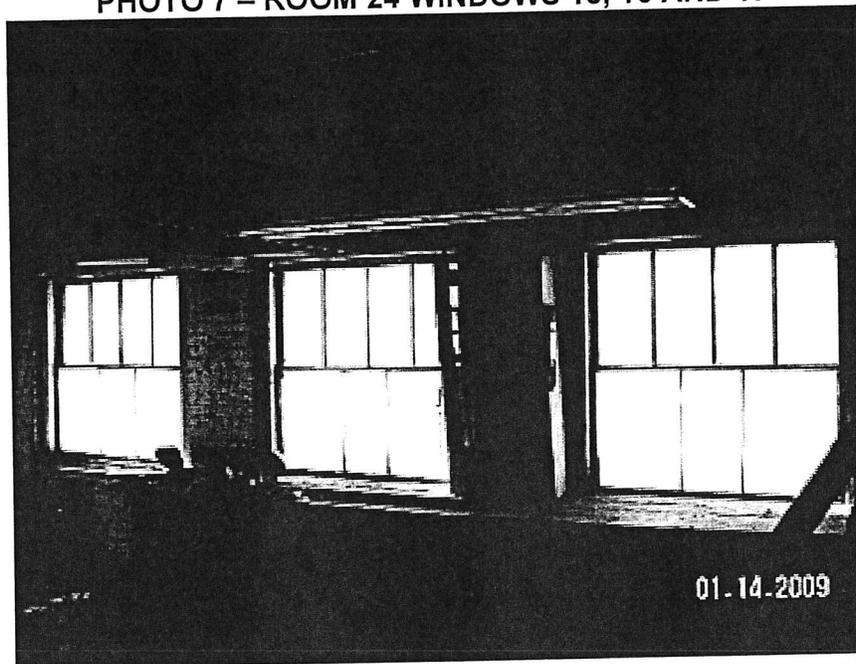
ROOM 24 WINDOWS 15, 16 AND 17
